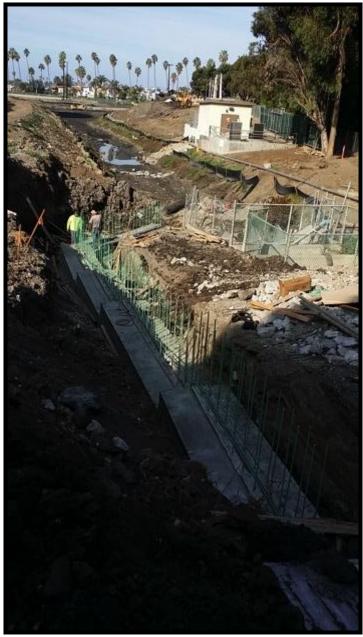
Photo facing northwest of CMB crew building forms for the boat ramp.
